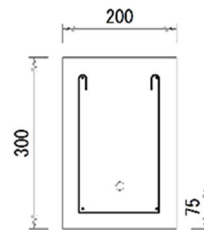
Cross section of a small-scale specimen (unit: mm)
